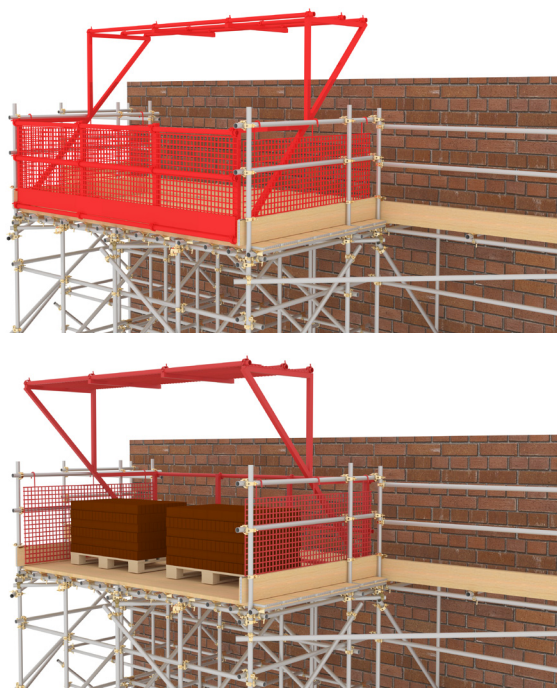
Example of a loading bay gate to maintain collective fall protection for the scaffold users when the loading bay gate is open.
